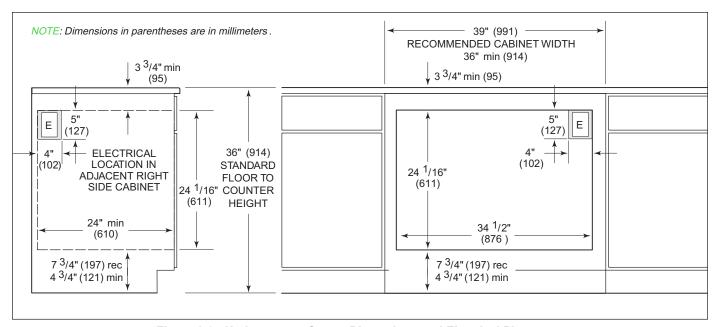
Undercounter Cutout Dimensions and Electrical Placement
